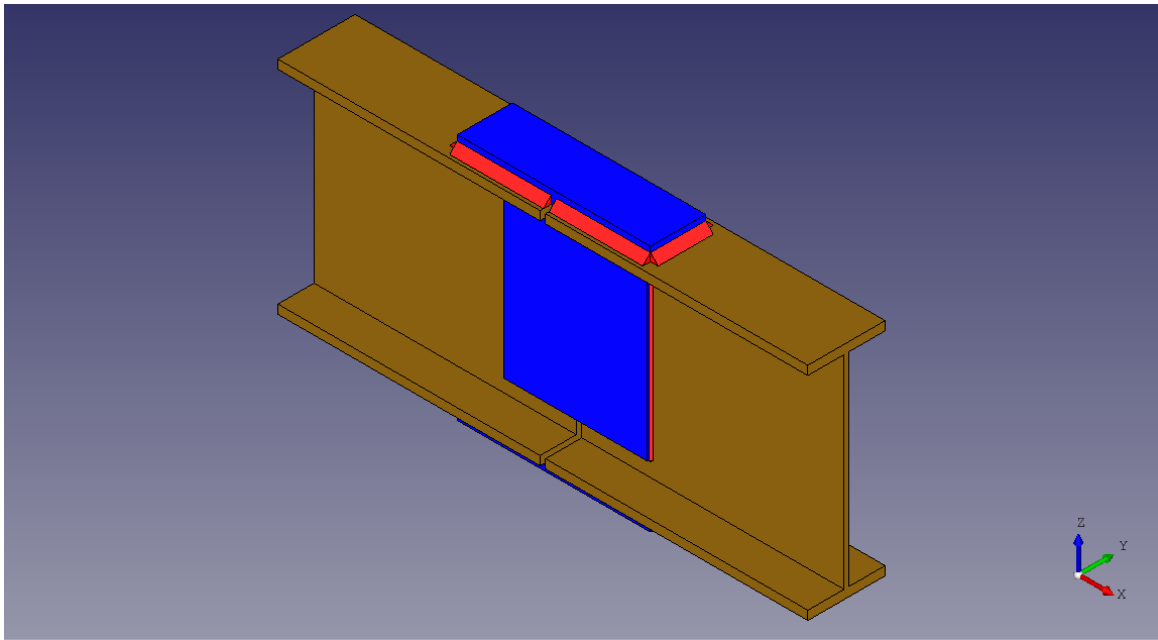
3D drawing output of typical Beam-Beam Cover Plate Welded connection
